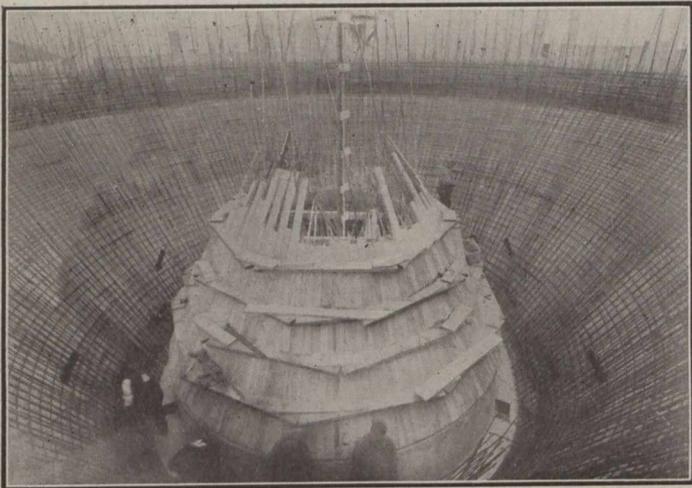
Interior View of Chemical House, Showing Reinforcing in the Bottom of the Cone-shaped Storage Bins for Alum.
